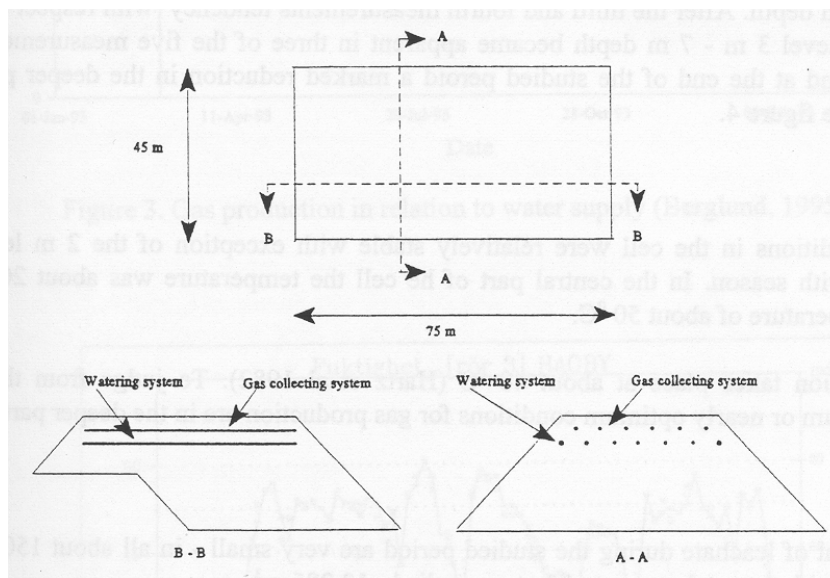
Plan and section of the digestion cell with watering and gas collecting system (Berglund,1998).
